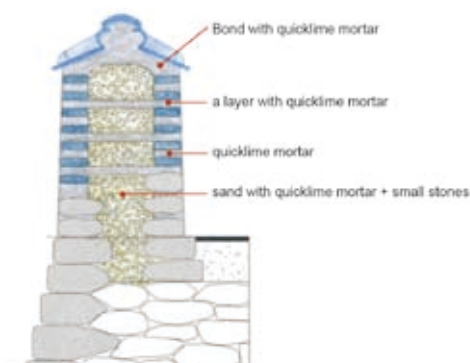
Cross-Section of Parapets of Bongam Outer Wall
